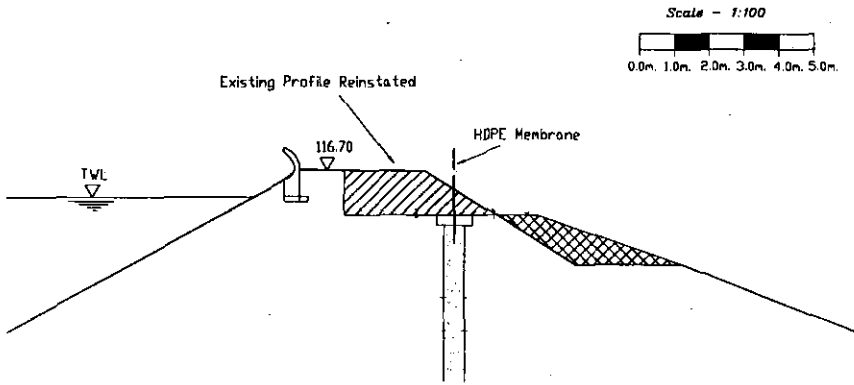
Section showing installation of HDPE membrane at the top of the wall
